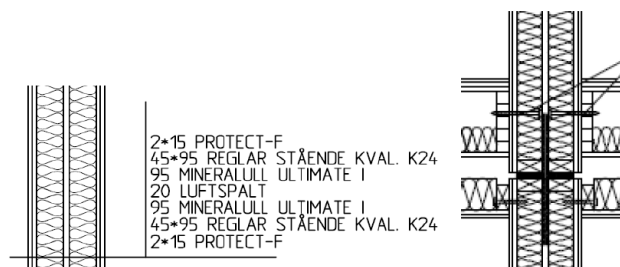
Drawings of the separating walls, i.e. inner walls (left) and the assemblage with the floor/ceiling (right).
